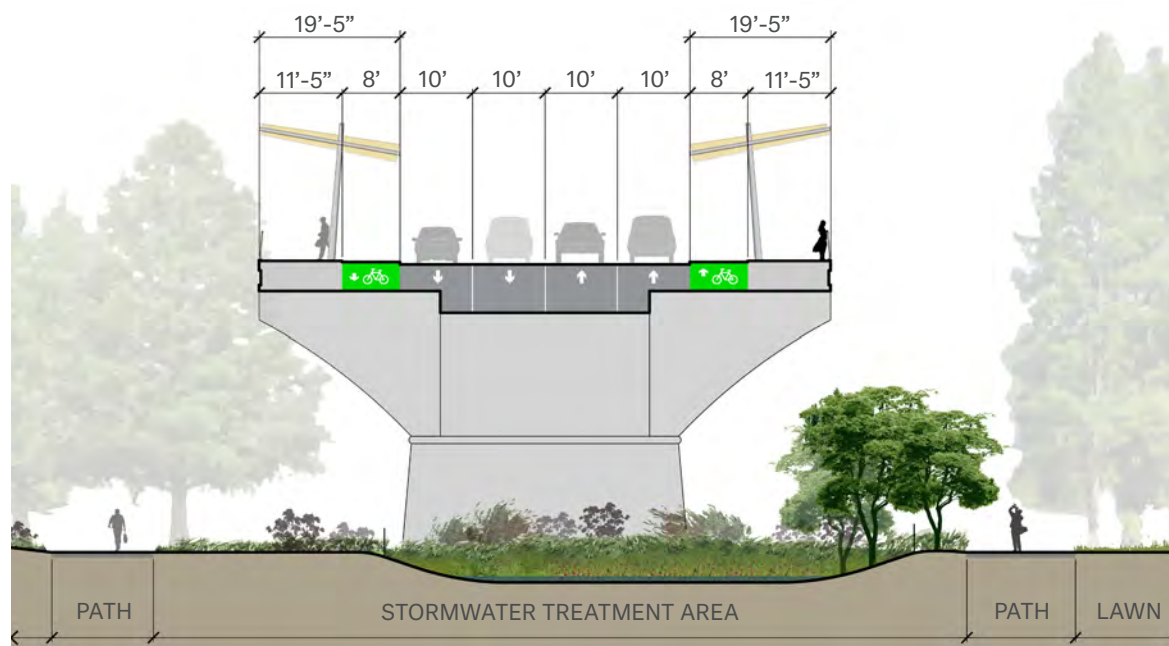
Section A-A': Design concept for Ann W. Richards Congress Avenue Bridge
